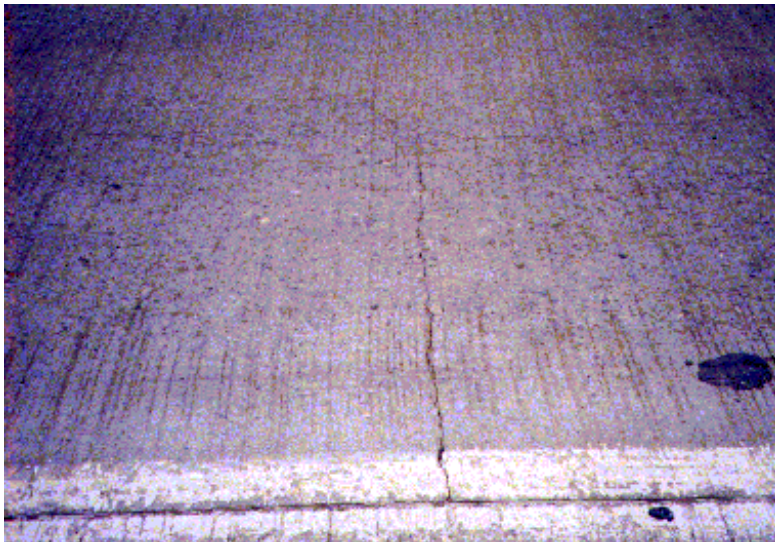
Transverse cracking with intersecting longitudinal crack (Winnemucca, NV).
